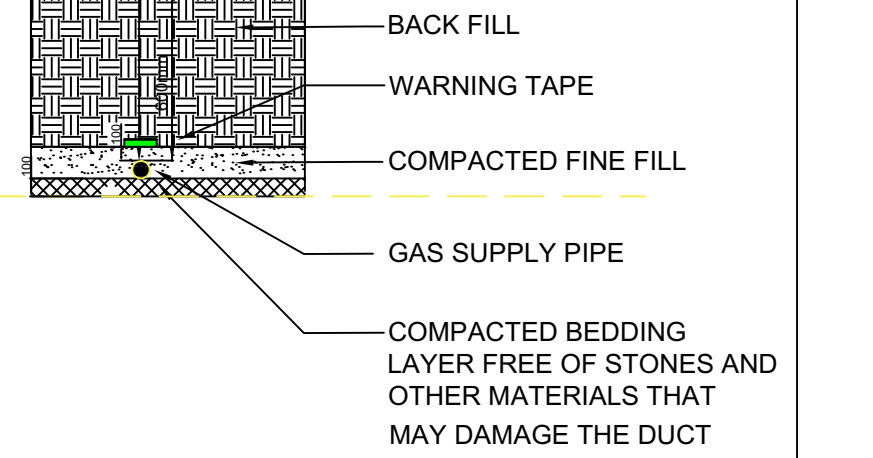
TYPICAL DETAIL FOR GAS PIPES
